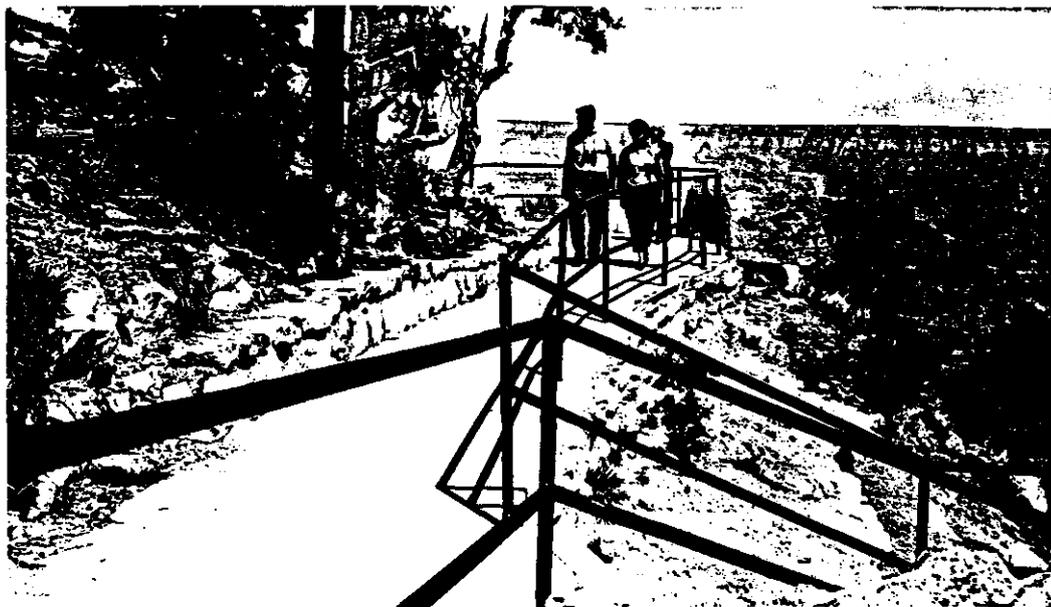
1962 modifications: Lower level concrete walk, steps, and pipe handrail at Trailview Point.
